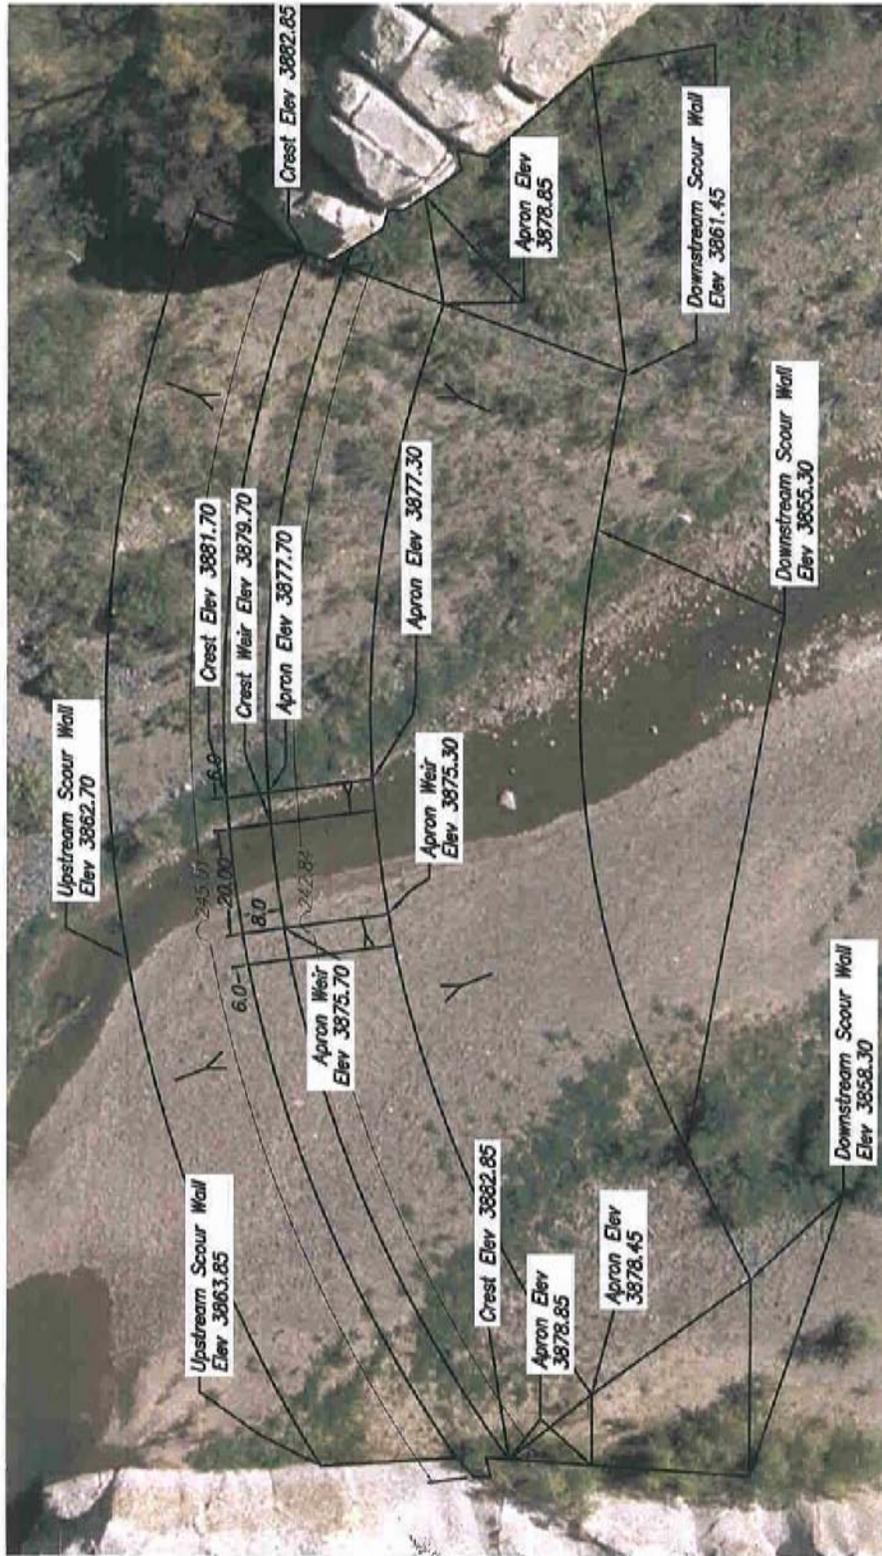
Plan view of the initial design of the fish barrier structure, with elevations of key points.
